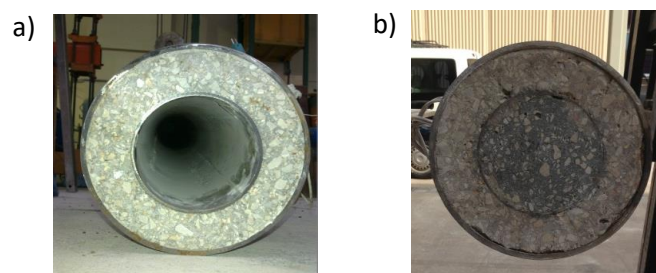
Different types of concrete-filled dual steel tube sections: a) double-skin section; b) double-tube section [8]
